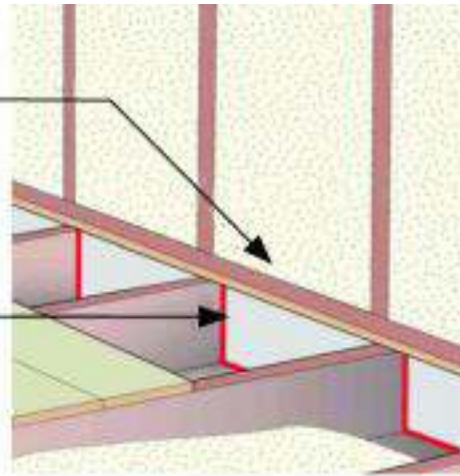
One way to air seal and insulate kneewalls – add insulation and a rigid air barrier along roof line of unconditioned attic space outside kneewall
